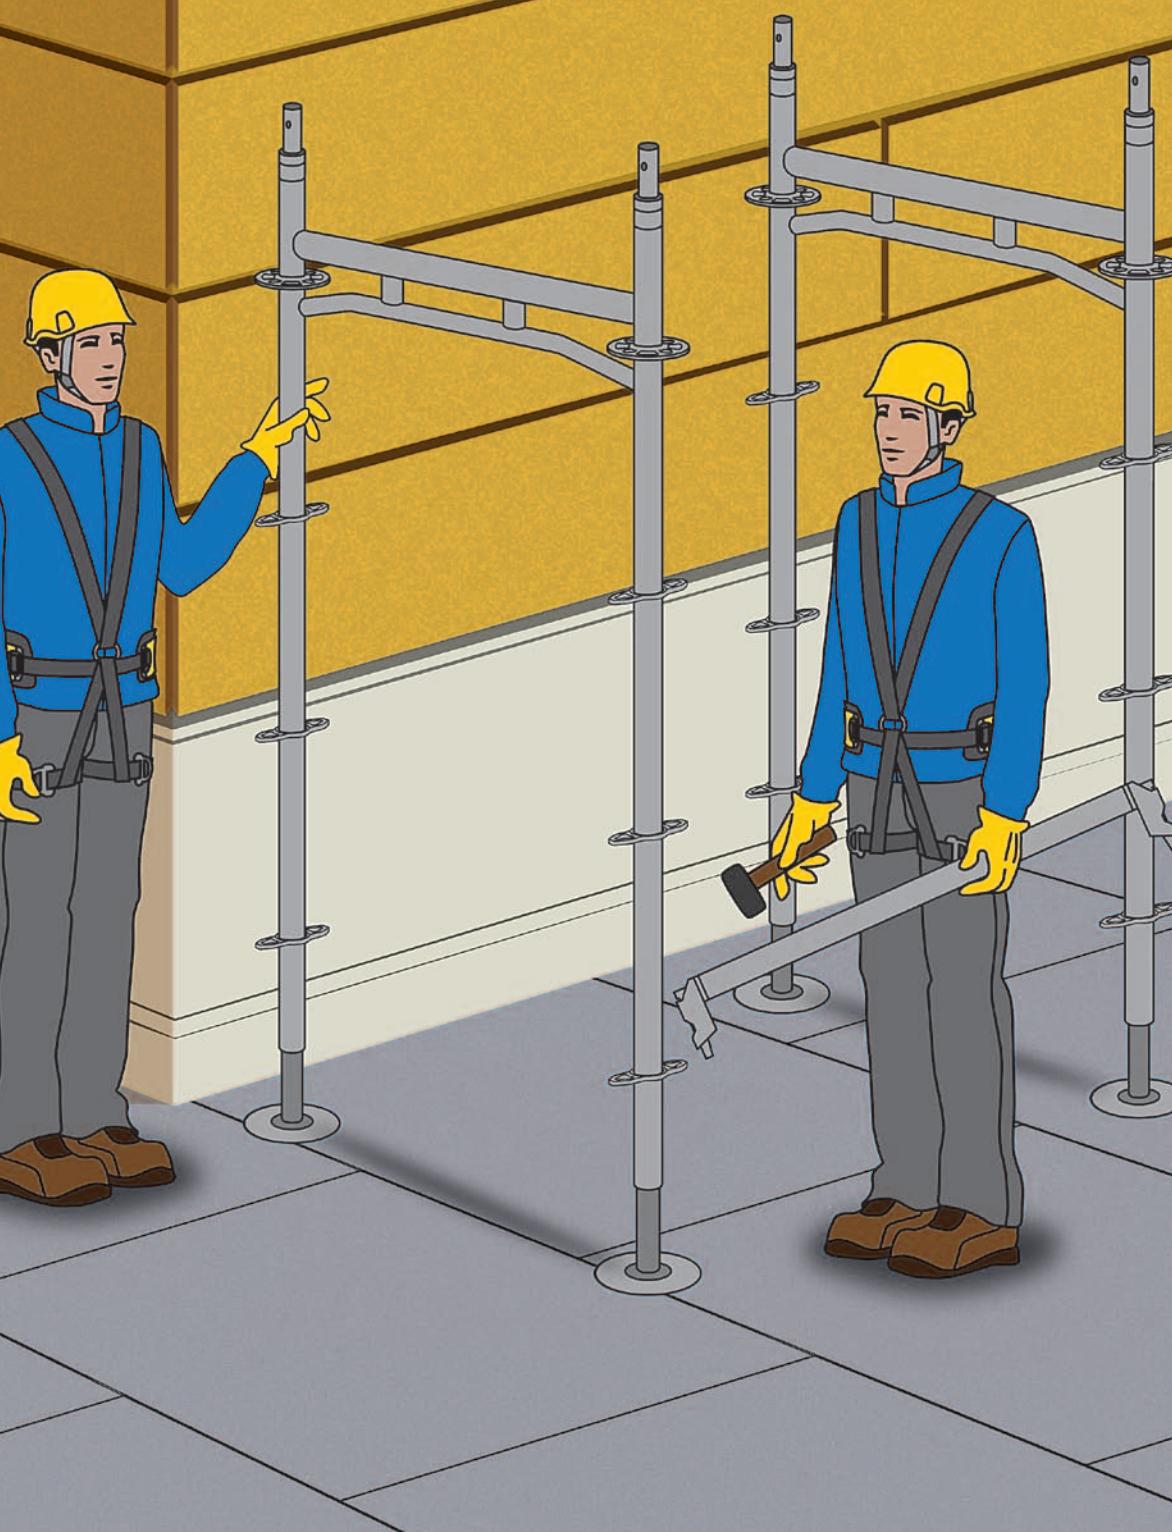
Scaffolding made of prefabricated frames. Connection system (clamp with wedge and washer)
